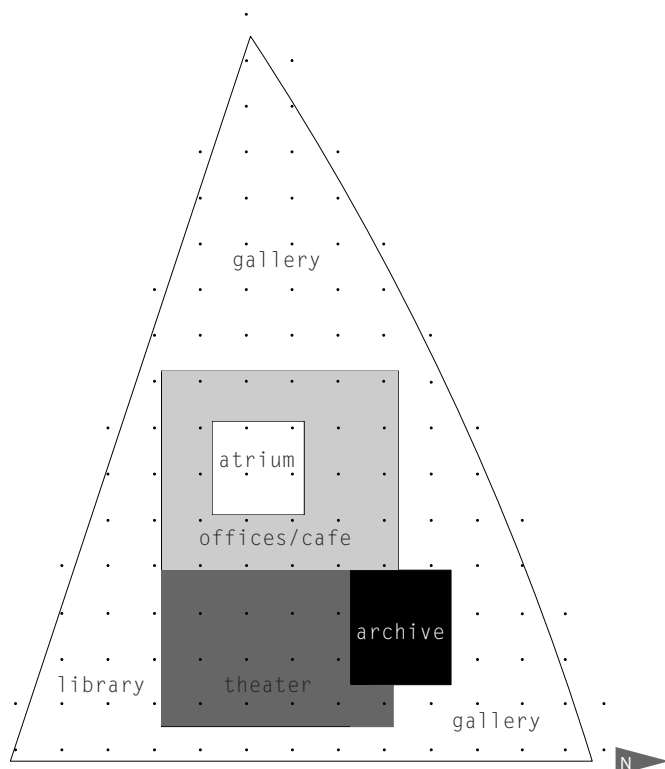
floor plan diagram of OMA's proposal for NAI Rotterdam
